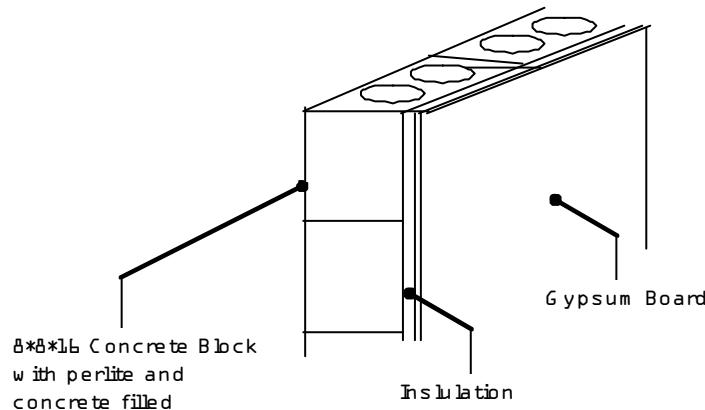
8" block wall with perlite and concrete fill (IECC1307.inp).
